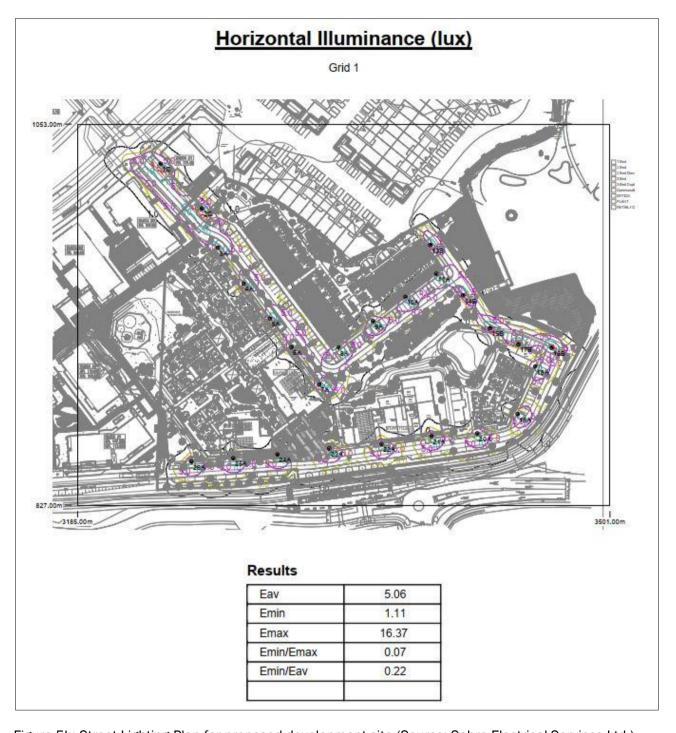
Street Lighting Plan for proposed development site (Source: Sabre Electrical Services Ltd.).
